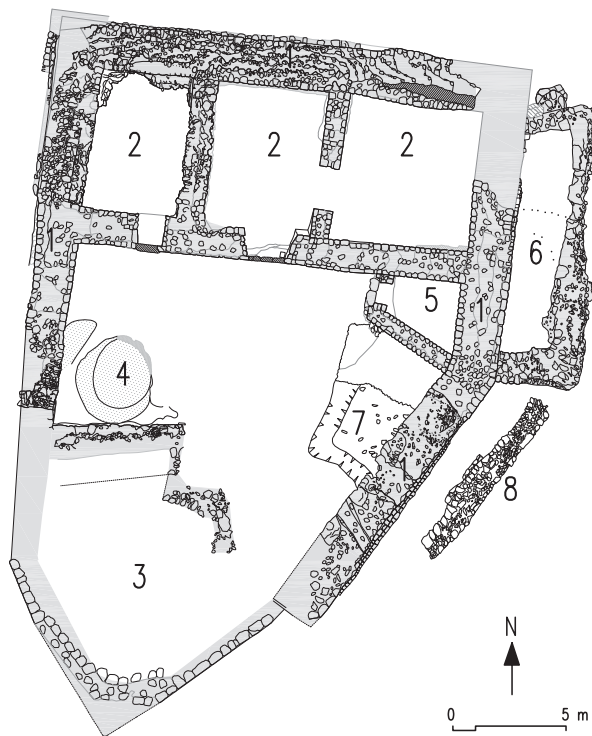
Vrbovec Castle – situation plan: 1 – curtain wall; 2 – residential part (ancillary structures at ground level of the hall building); 3 – keep; 4 – cistern; 5 – eastern trapezoidal room; 6 – defended entrance; 7 – wooden tower from the 16th century; 8 – 16th-century wall (plan by V. Žinić Justić, H. Justić, M. Vojtić, K. Vujica and K. Turkalj).
